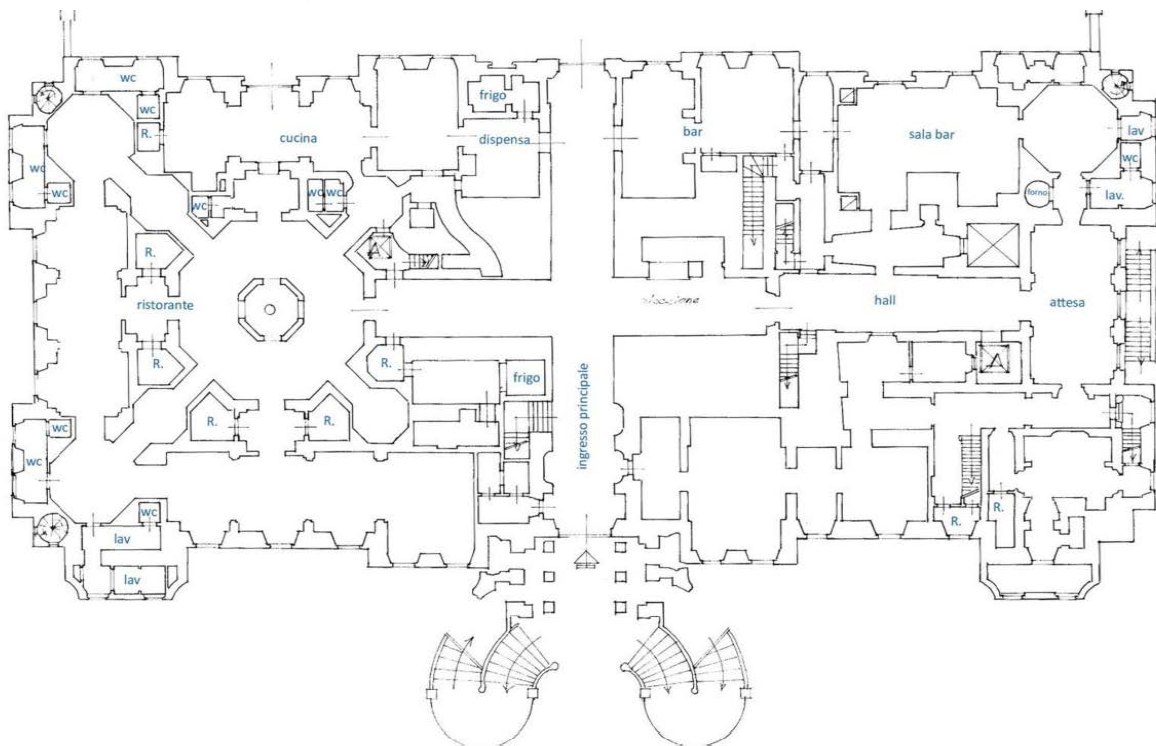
GROUND FLOOR PLAN BY CODLWELL BANK COMMERCIAL
